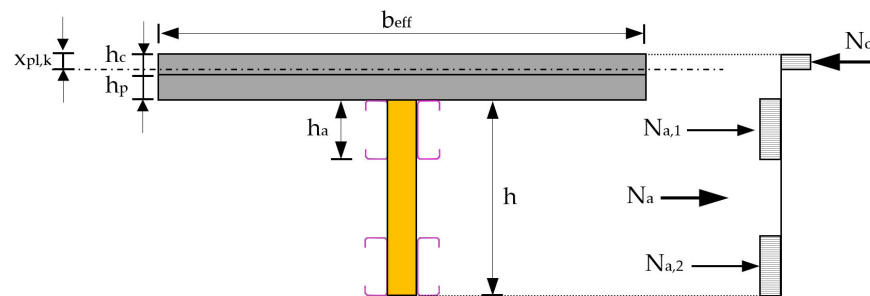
Cross section of the analyzed LWT-FLOOR composite beam.
